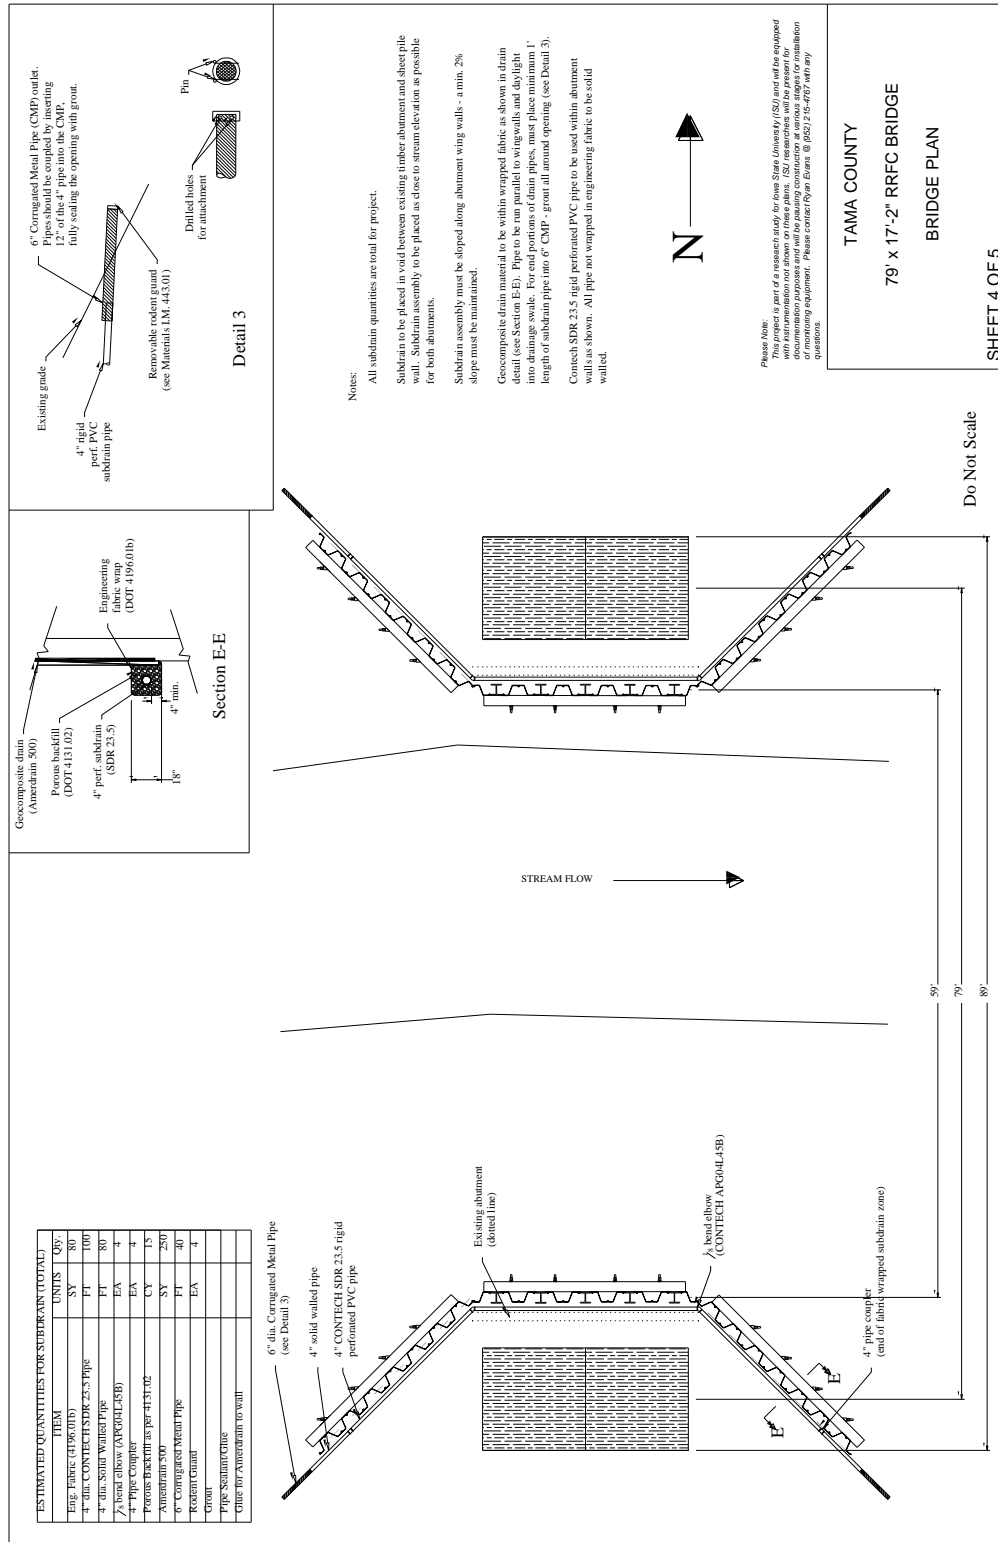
Bridge plan (alternative system) for demonstration project in TC, Iowa
